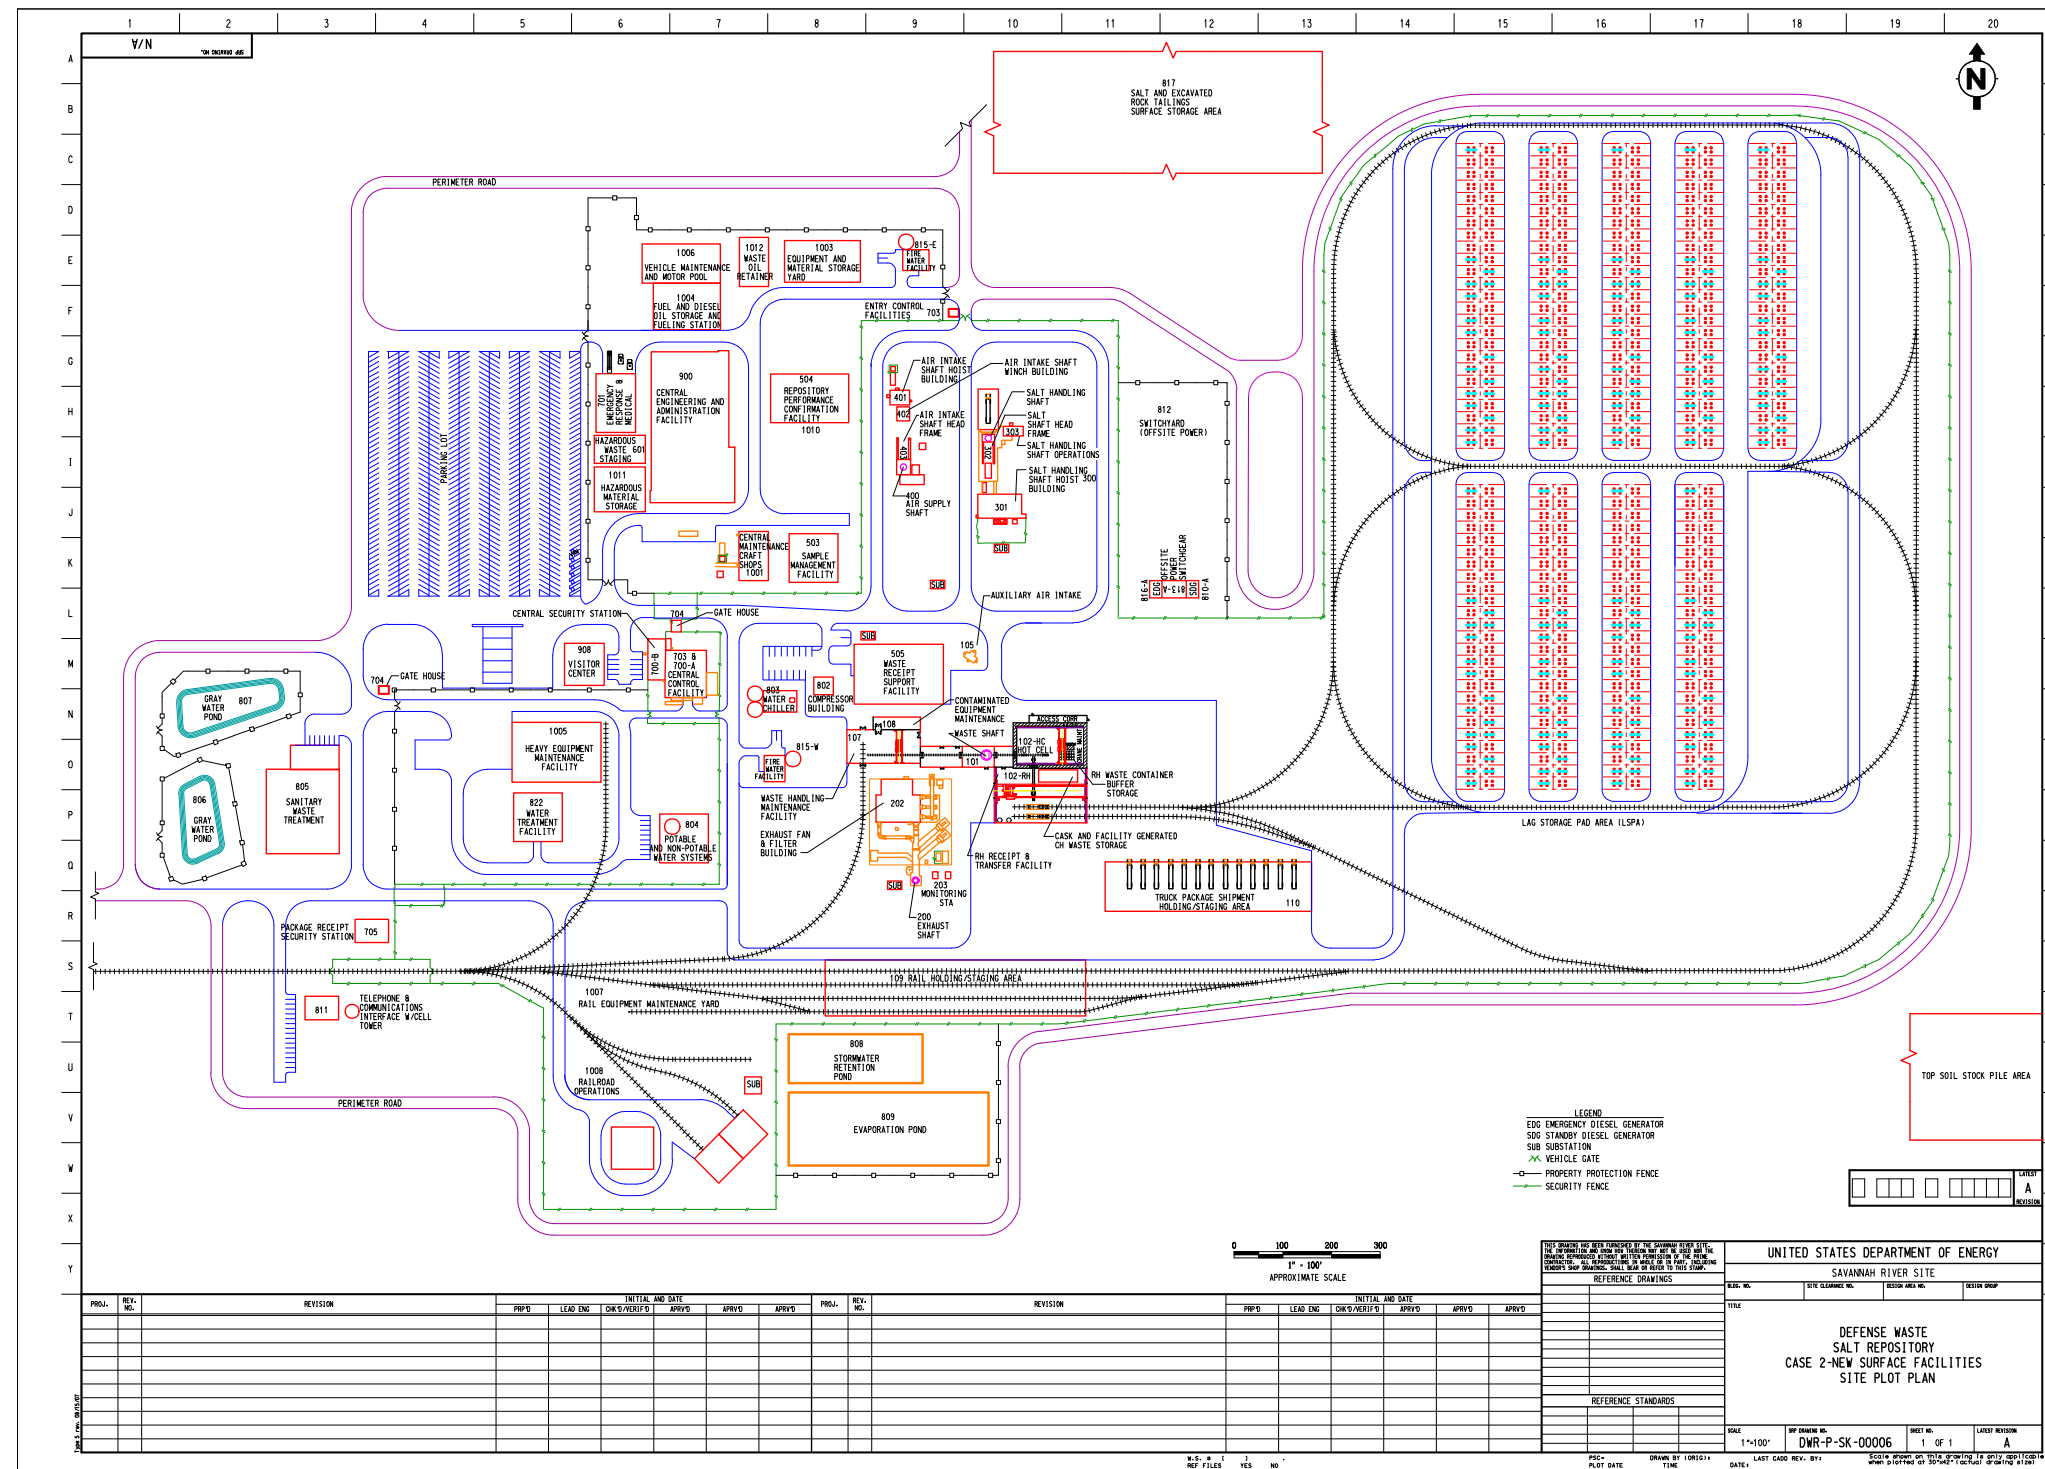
Case 2 WRTF Surface Facilities Site Plot Plan
